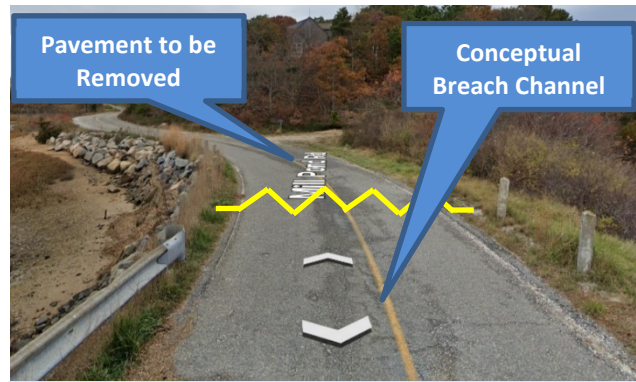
Approximate Limit of Pavement Removal and Channel Breach North of Mill Pond Culvert (facing north)
